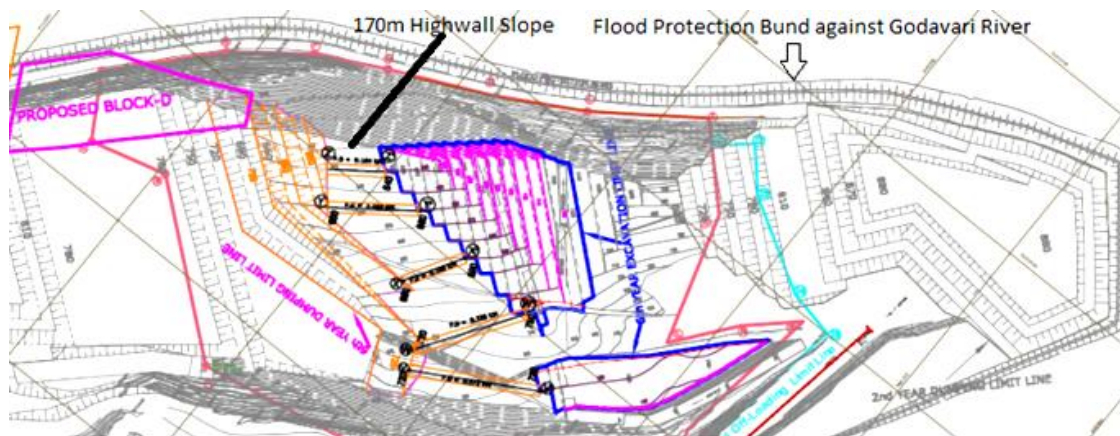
Mine Plan depicting slope of 170m highwall of Medapalli OCP
